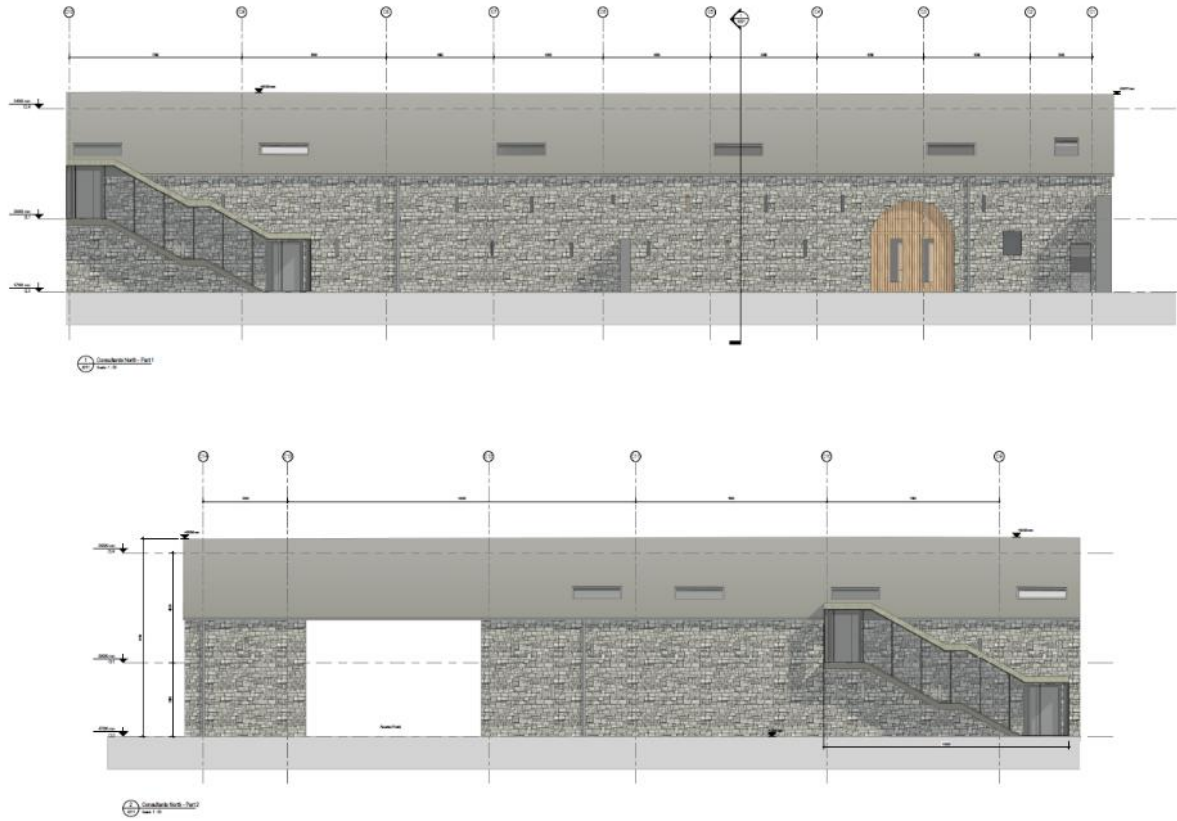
Proposed north elevation. Above: Part 1. Bottom: Part 2.
